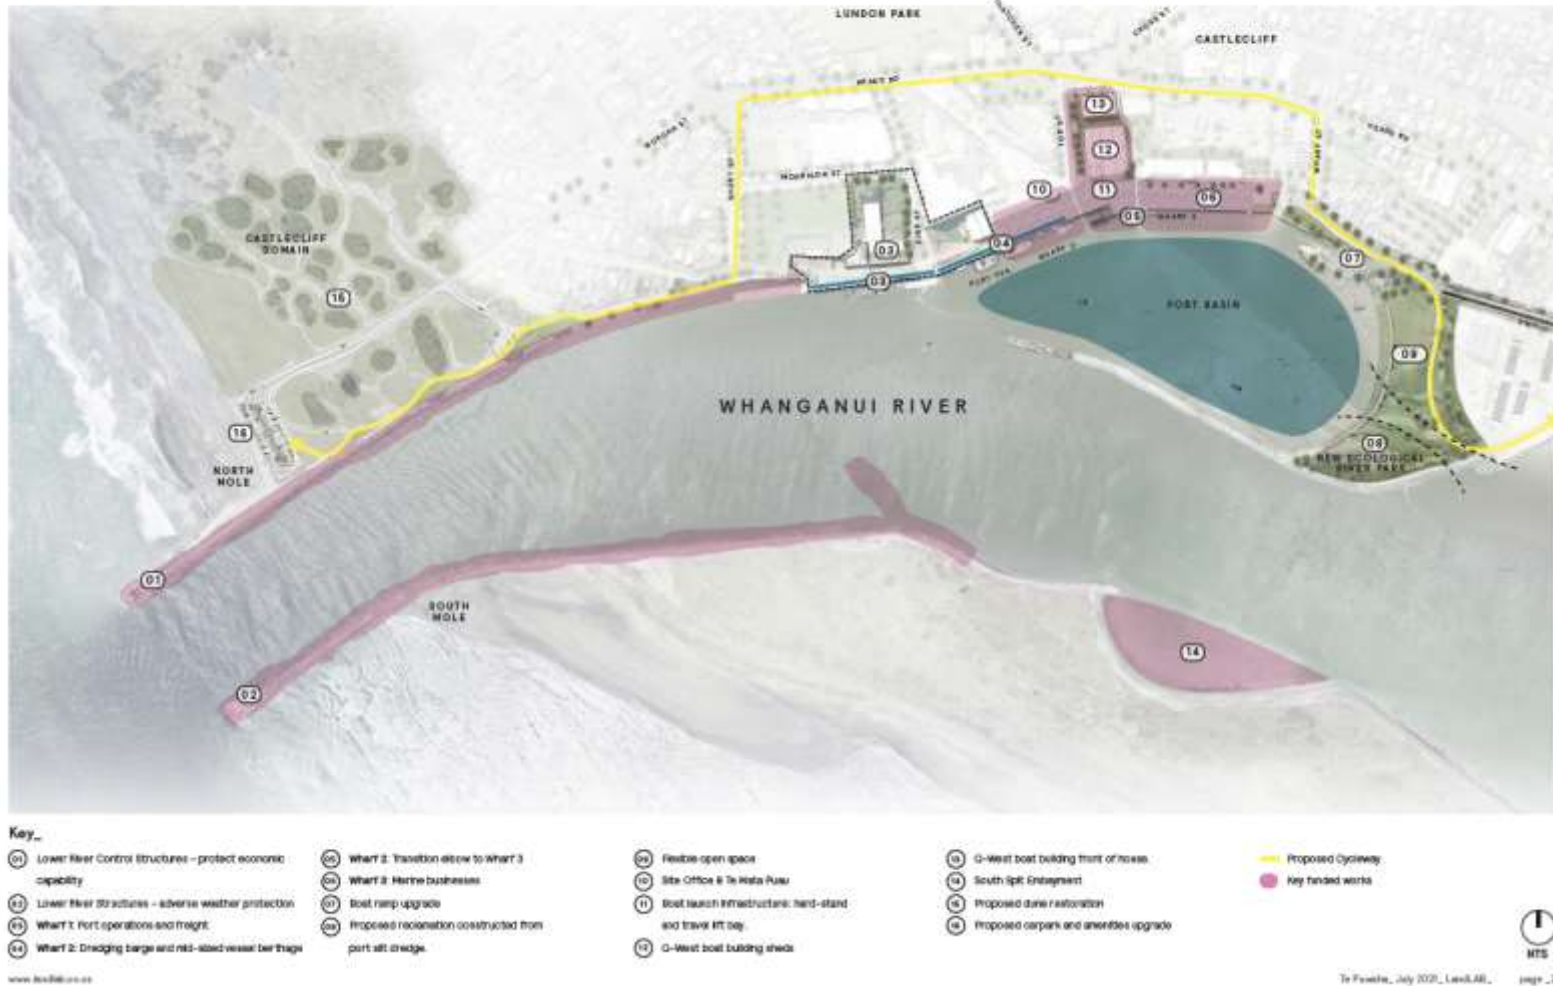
Indicative Te Pūwaha Master Plan - Concept Design (Source: WDC)
